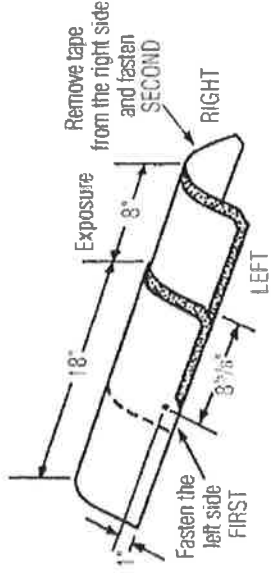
Installation of Shingle® Ridge shingles on hips and ridges.
